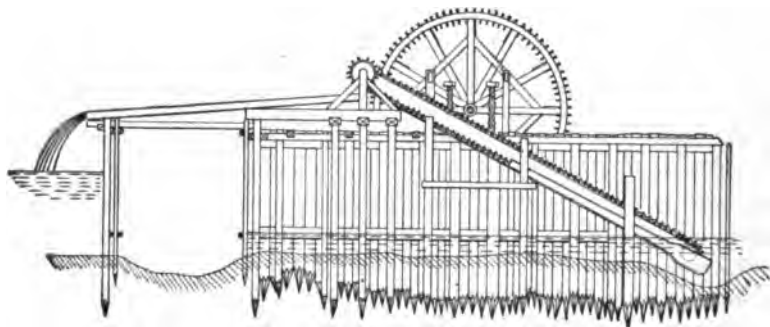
OLD CHAPELET, SIDE ELEVATION.
